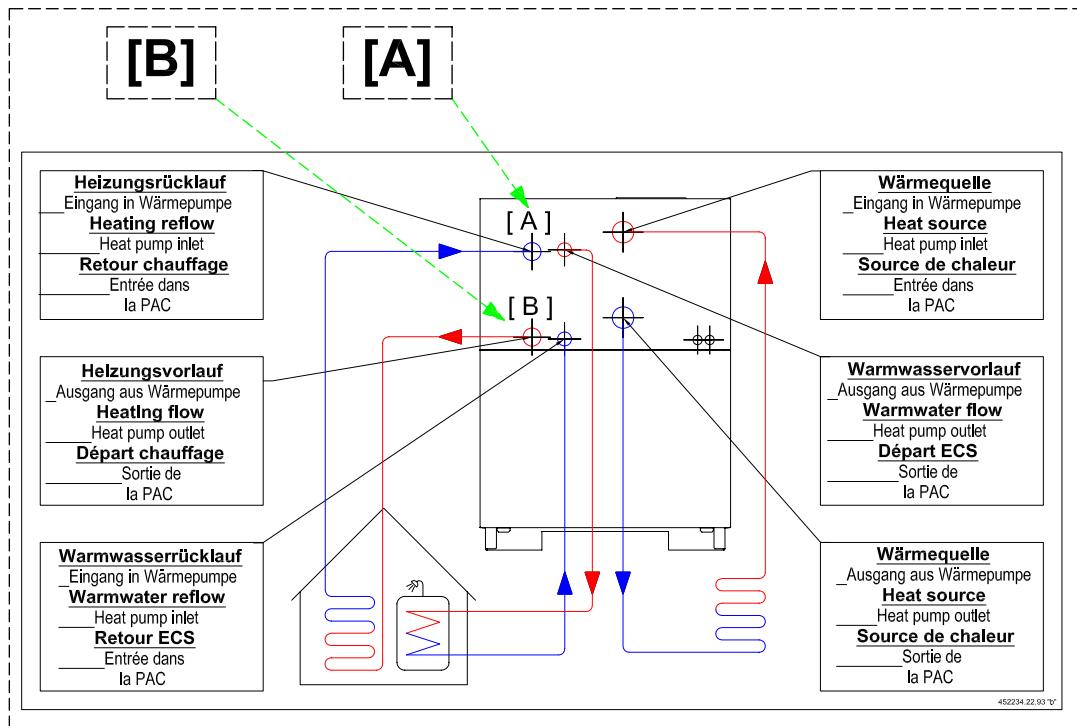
• Schematic view / heat pump connections (label affixed inside the heat pump)
